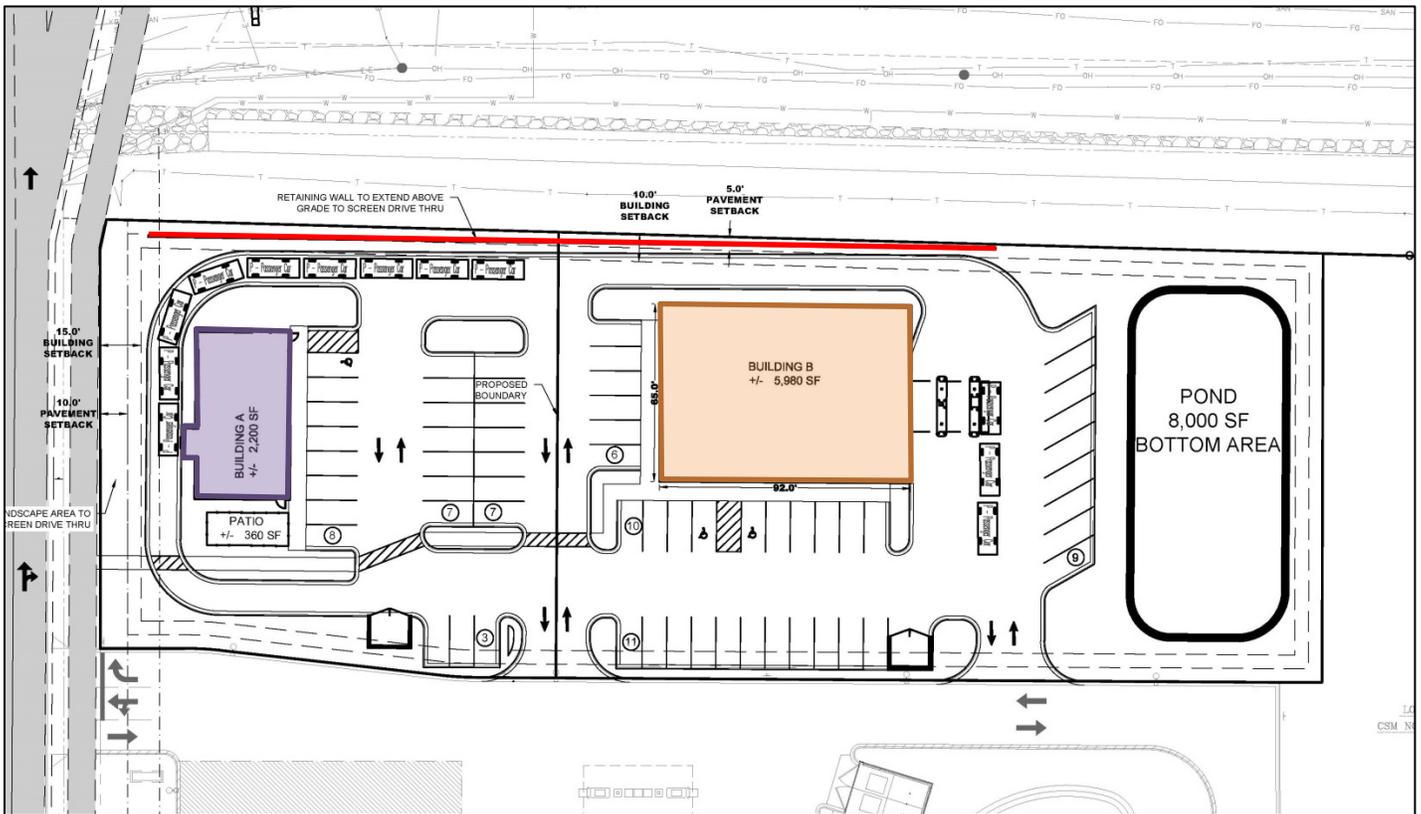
Initial plan with buildings shown in color and the retaining wall in red.
